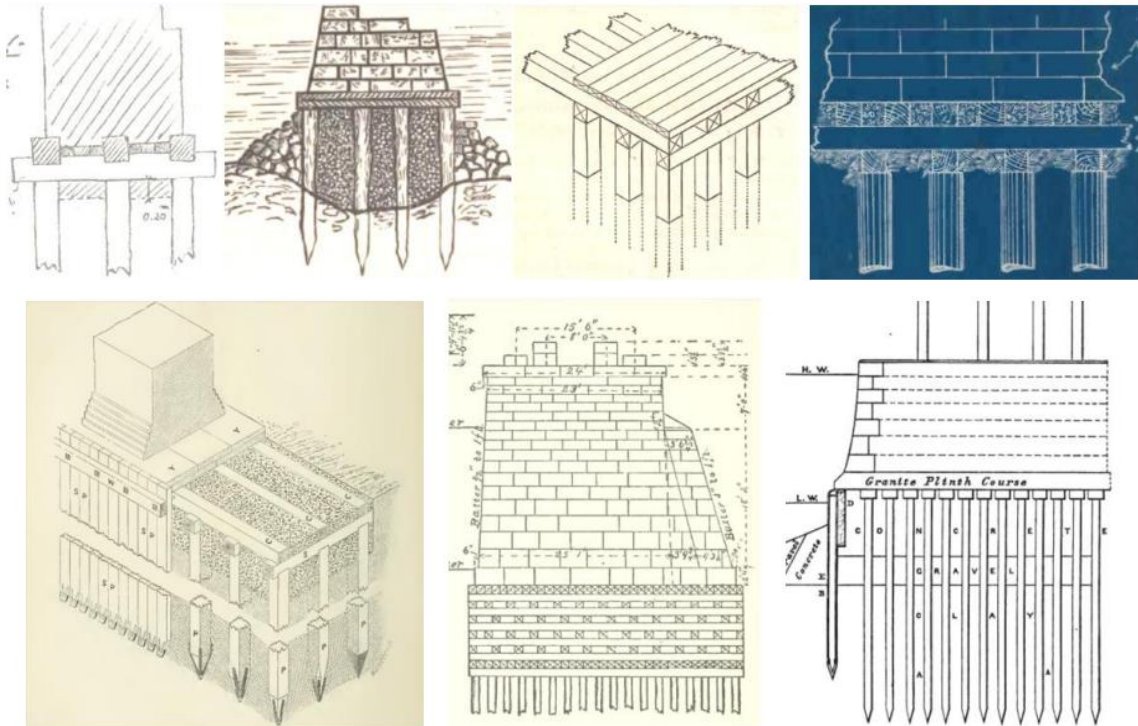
Examples of wooden grid (M. Feyzi, 1911) (Hasley, 1883) (Dobson, 1872) (Derleth, 1921) (Notes on Building Cons., p.228) (Baker, 1902) (Ashpitel, 1867) (Dabanlı et al., 2013)
